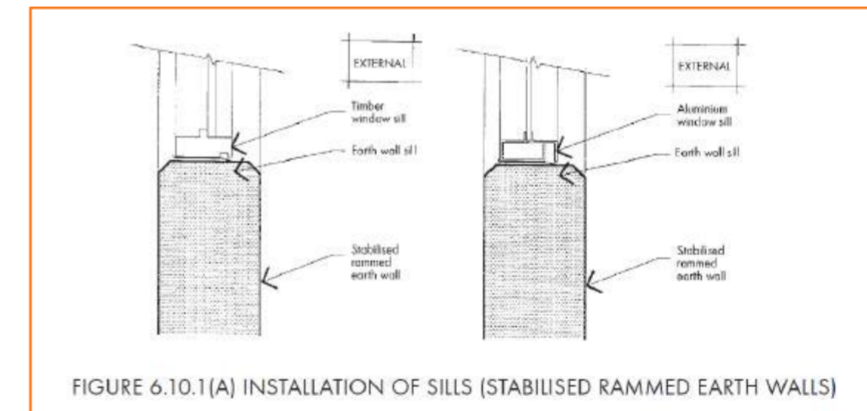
Typical window detailing, noting the sill flashing and chamfered edge. Extract from *Building with earth bricks and rammed earth in Australia
